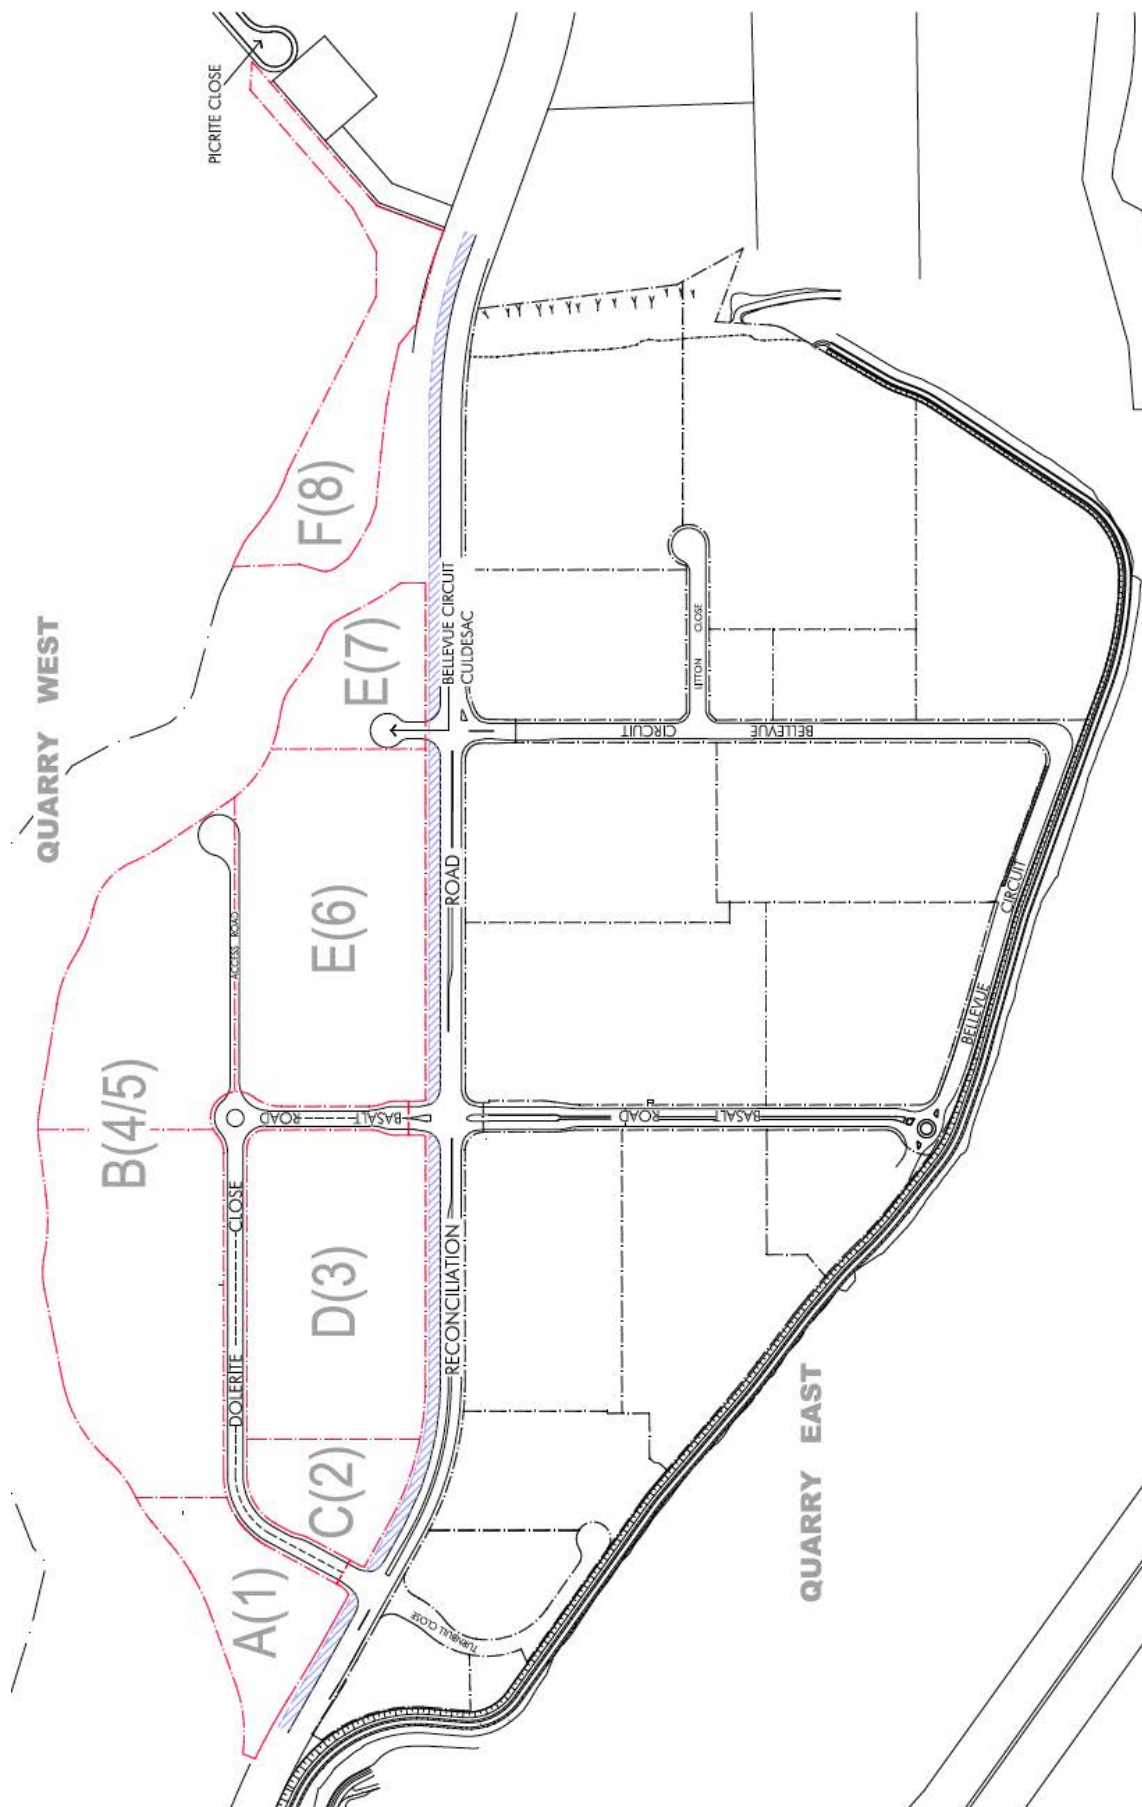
Subdivision Concept Plan (Source: Nettleton Tribe)
